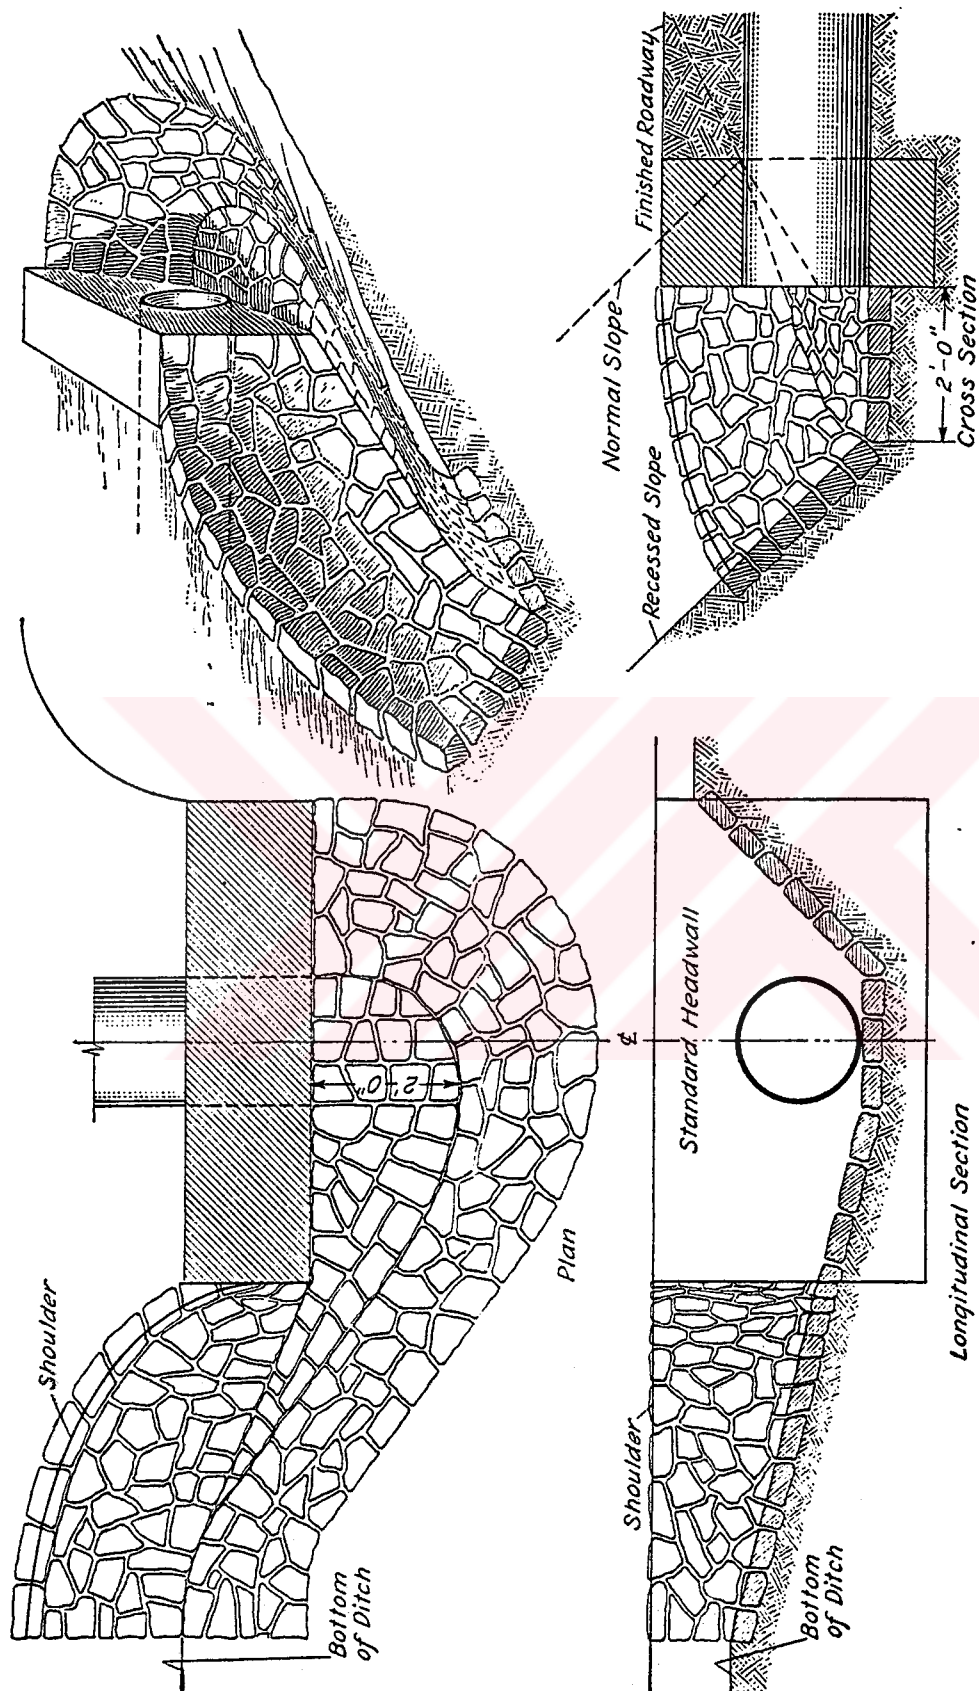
Design of a paved inlet to a culvert pipe (Bruce&Clarkeson, 1960)
